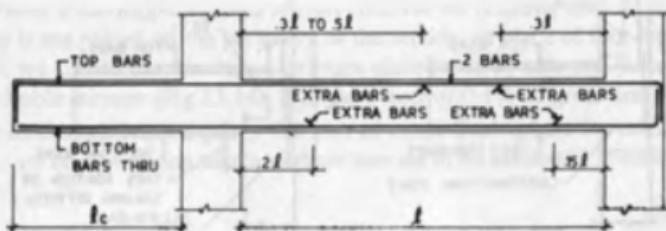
Detailing of cantilever (l_c) with top bars fully anchored in the adjoining span.
